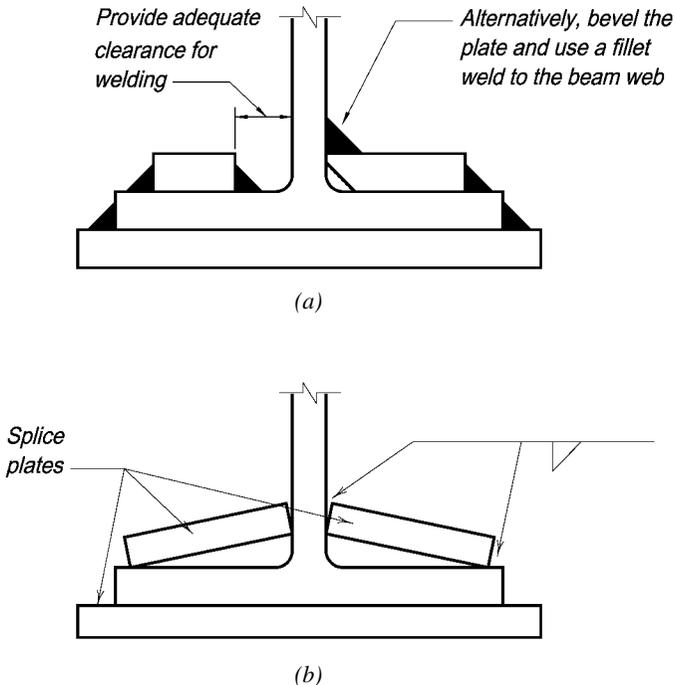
Welding clearances for flange-plated moment splices.
